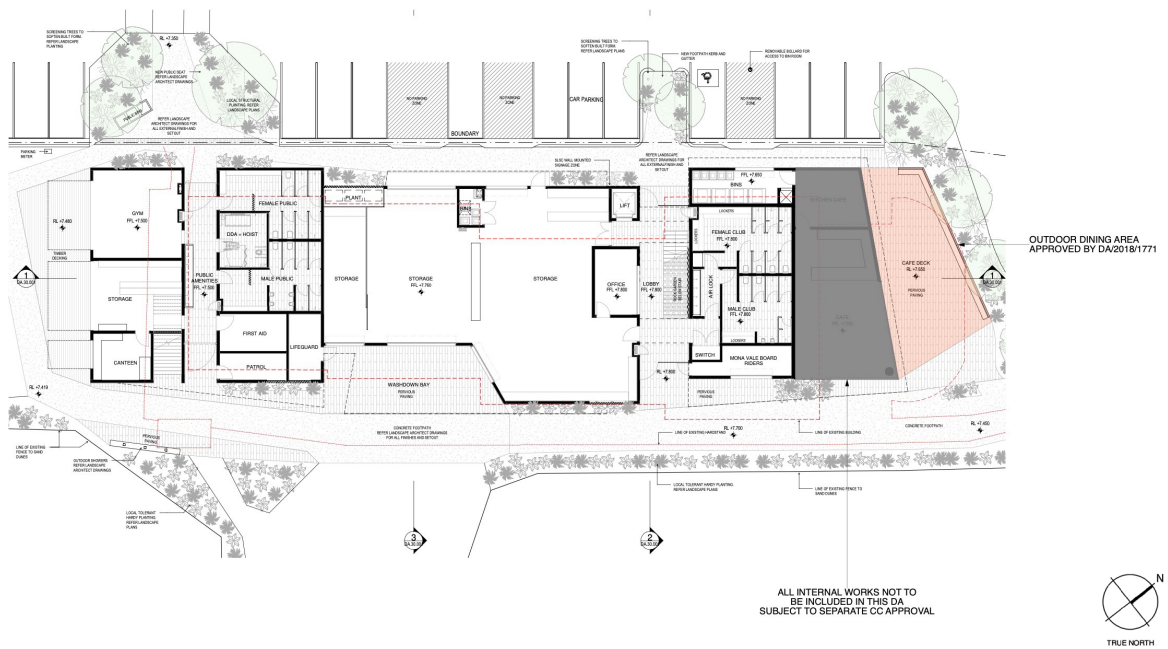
Site Plan showing subject cafe outdoor area shaded in orange.
